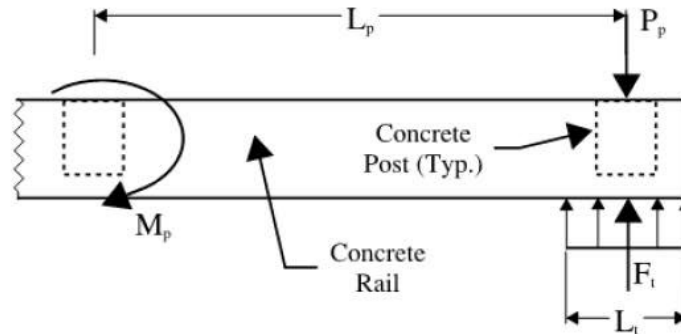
Single-Span Failure Mode for Post-and-Beam Railings at an End Section or Joint
